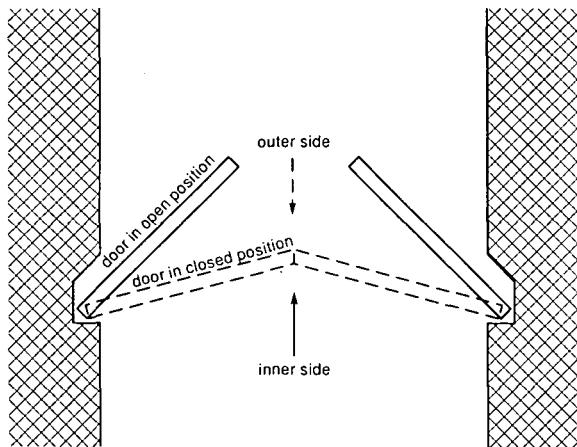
Plan view of an outlet sluice with vertical doors (Smedema and Rycroft 1983)
